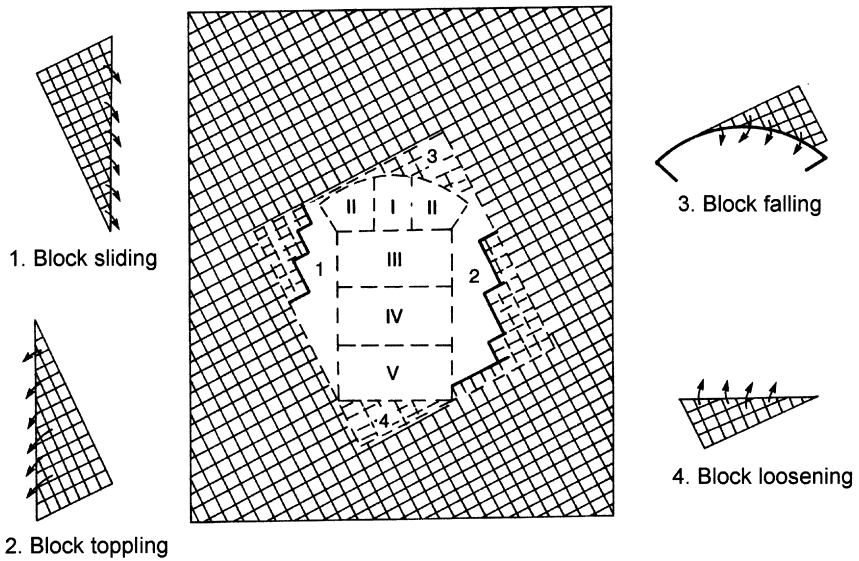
Potential failure patterns of the opening and sequence of excavation.
